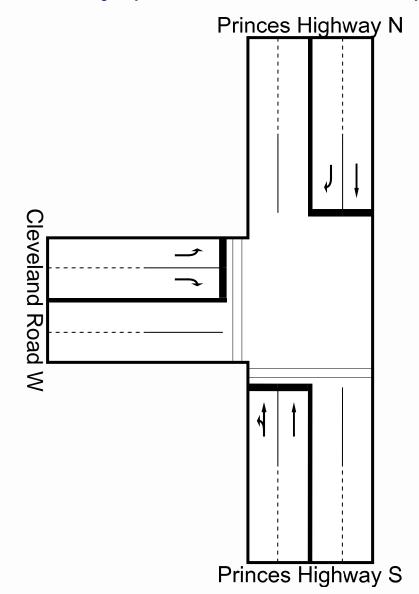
Princes Highway/Cleveland Road 2008 Intersection Layout
